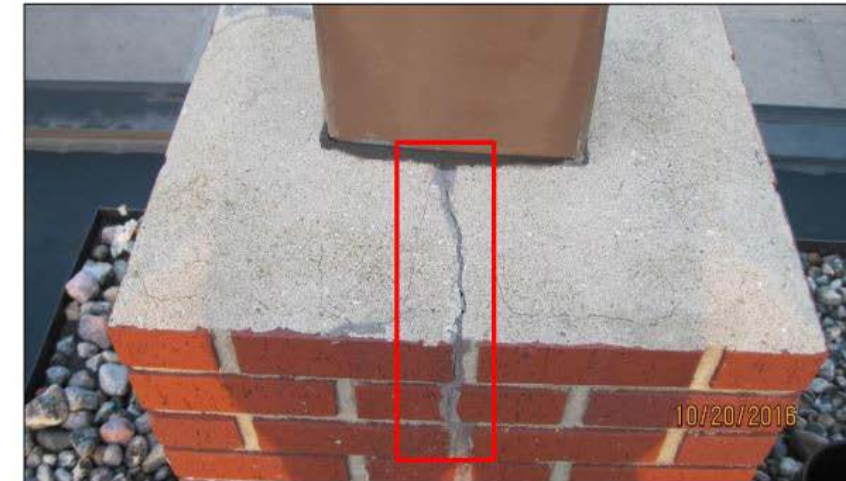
The masonry chimney cap has multiple large cracks that have been repaired with a secondary sealant, one crack is outlined in red.
